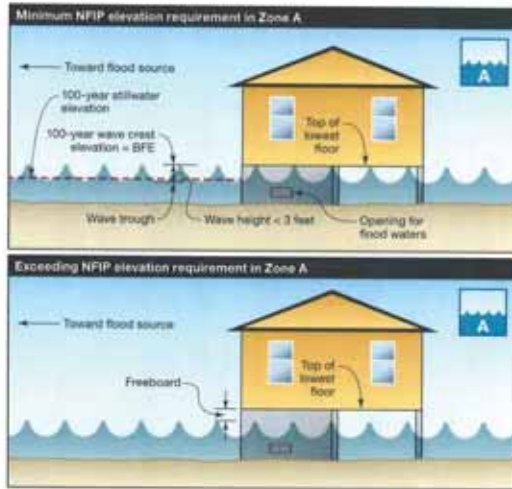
Recommended elevation for buildings in Zone A compared to minimum requirements
